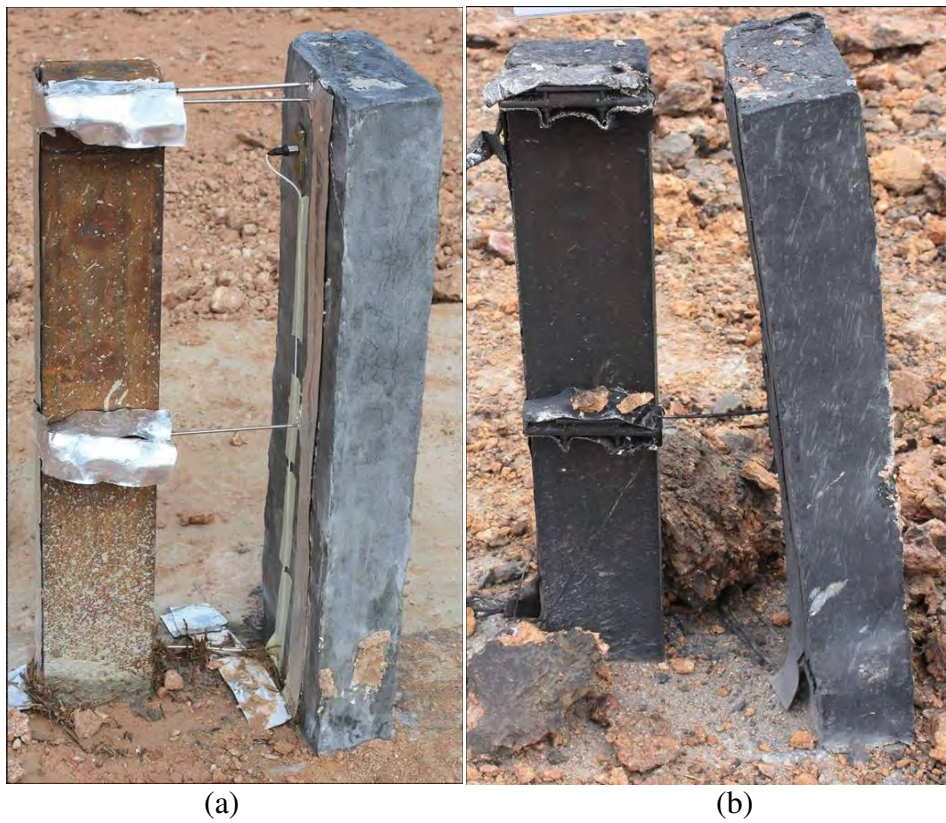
Q-ECC10-5-MI specimen (a) Before (b) After explosion
